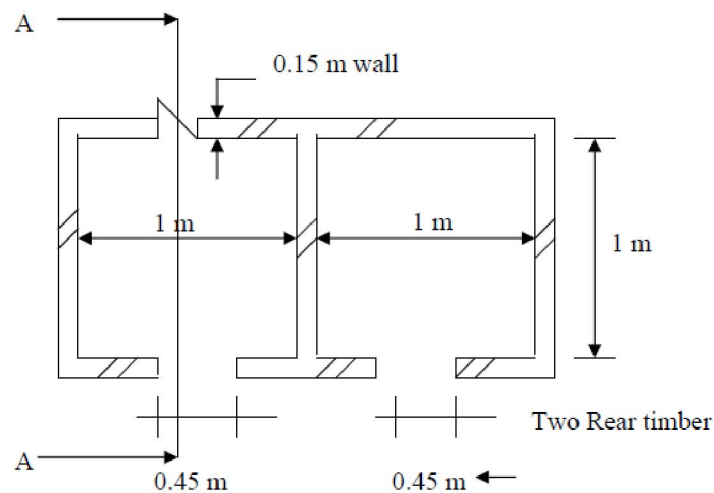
Floor plan of double vault UDDT (ROSA Arusha, 2009)
